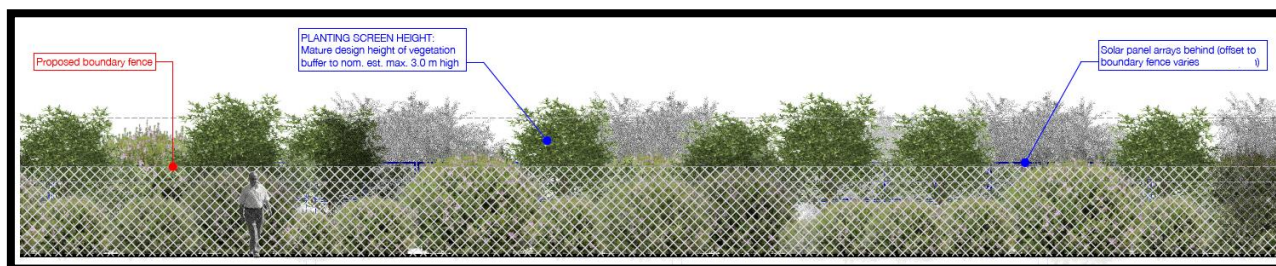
Typical vegetation buffer front elevation (Source: Ground Control Landscape Architecture)
